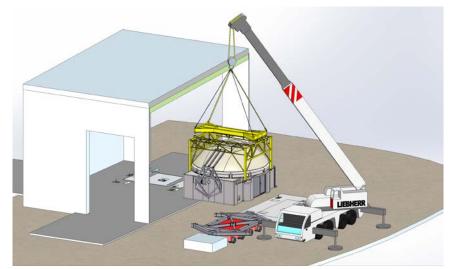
3D-CAD drawing of the UT being loaded on to the Transporter
